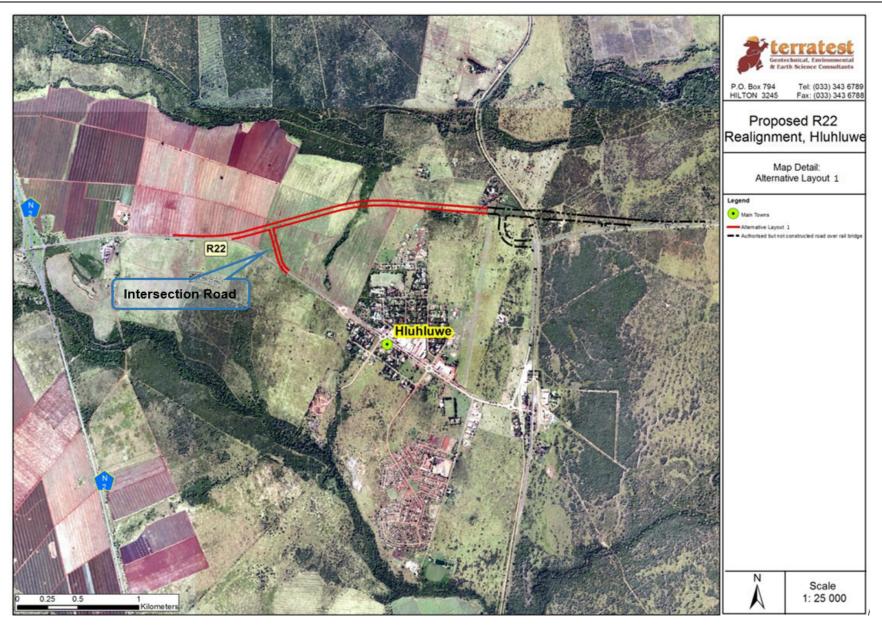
Alternative Layout 1 (red), which differs from the Preferred Layout alignment because of the location of the Intersection Road. Alternative Layout 1 will tie into the Authorised Road-Over-Rail Alignment (black).
